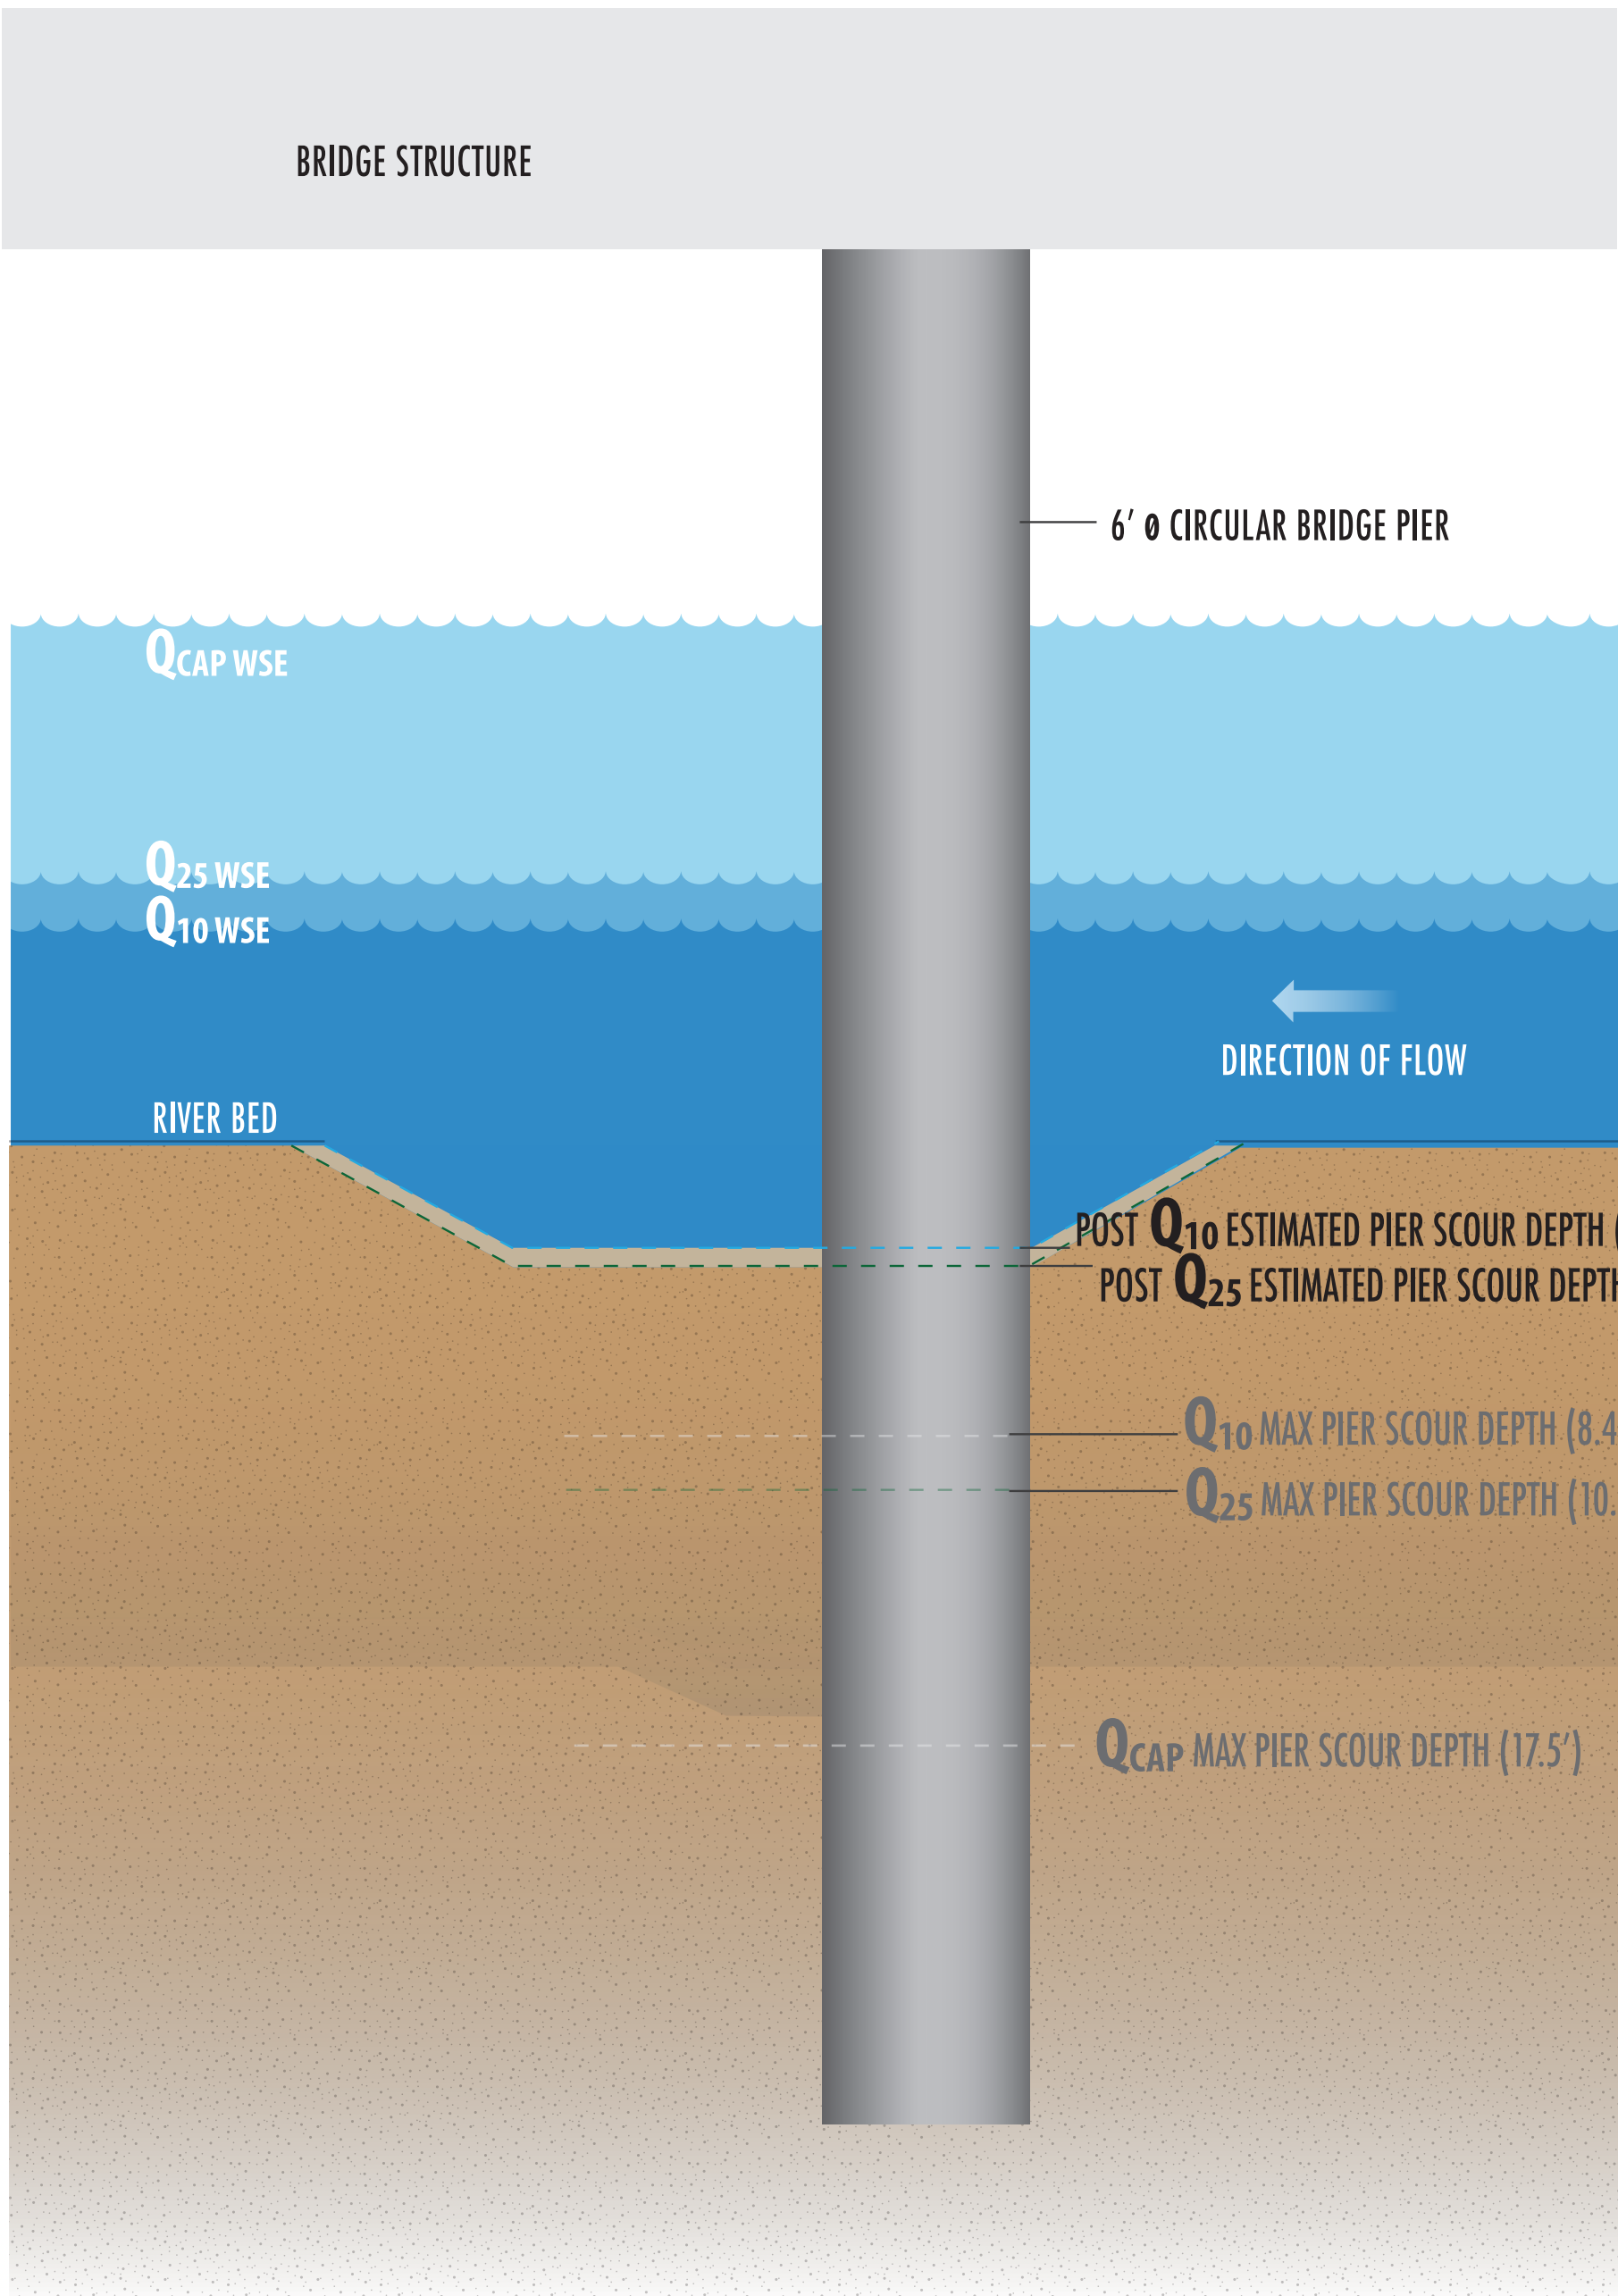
CROSS SECTIONAL VIEW OF PIER SCOUR AT COMMERCE CENTER DRIVE BRIDGE
